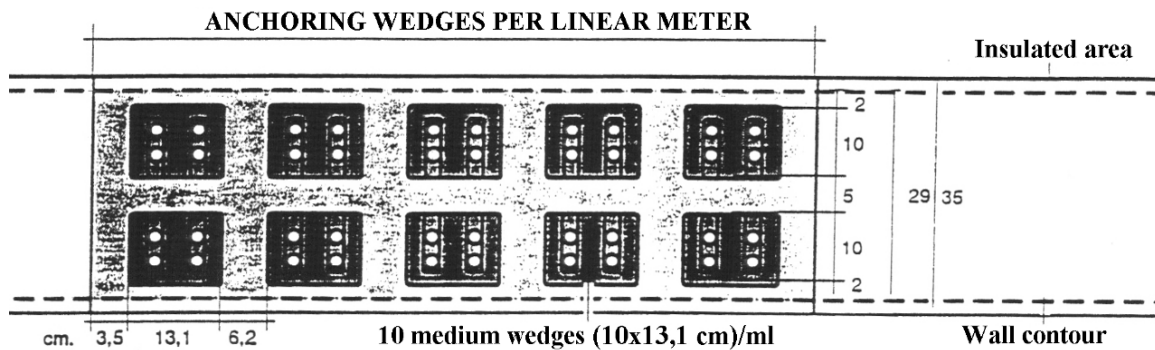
Right arrangement of anchoring wedges for a 29 cm wall thickness.
